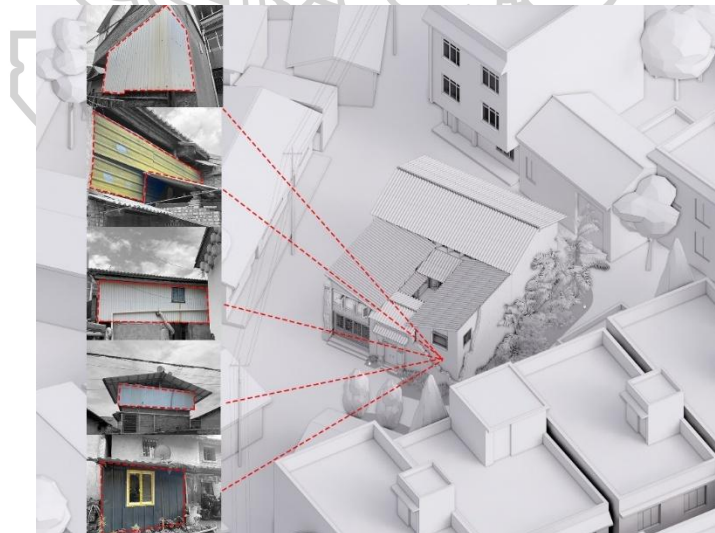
Colored Corrugated Roofing Sheets on the Wall
